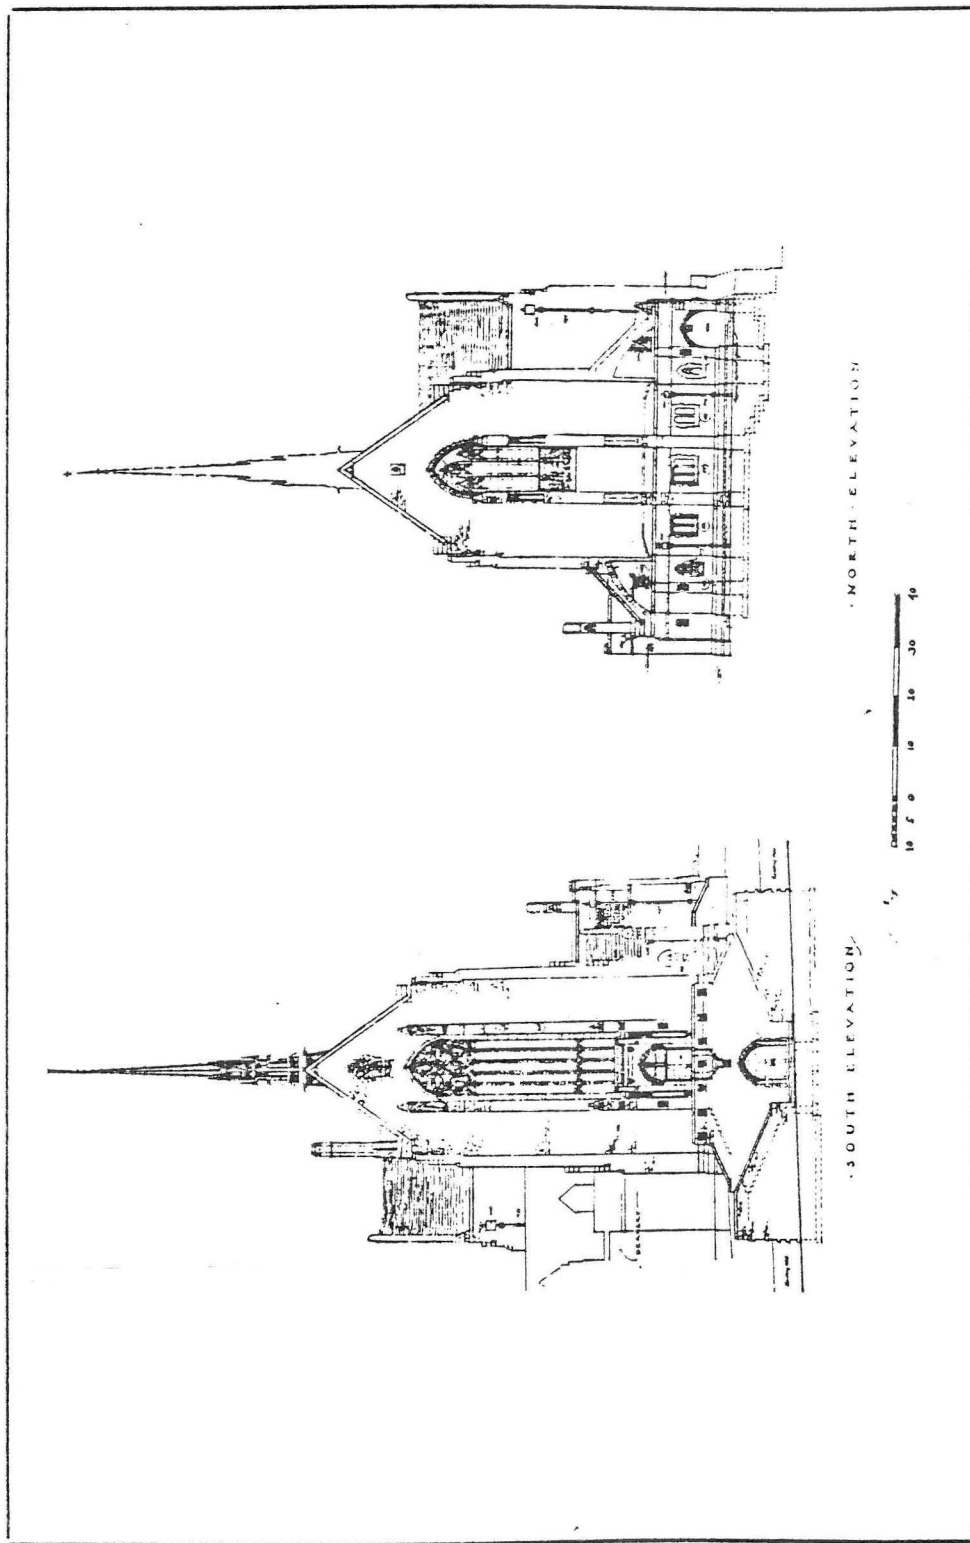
South and North elevation, St. Andrew's Chapel, Divinity School
